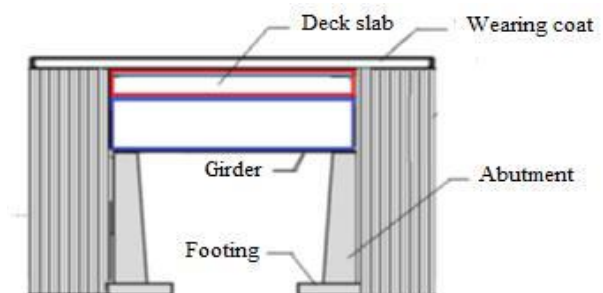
Longitudinal section of T-Beam Deck Slab Bridge
